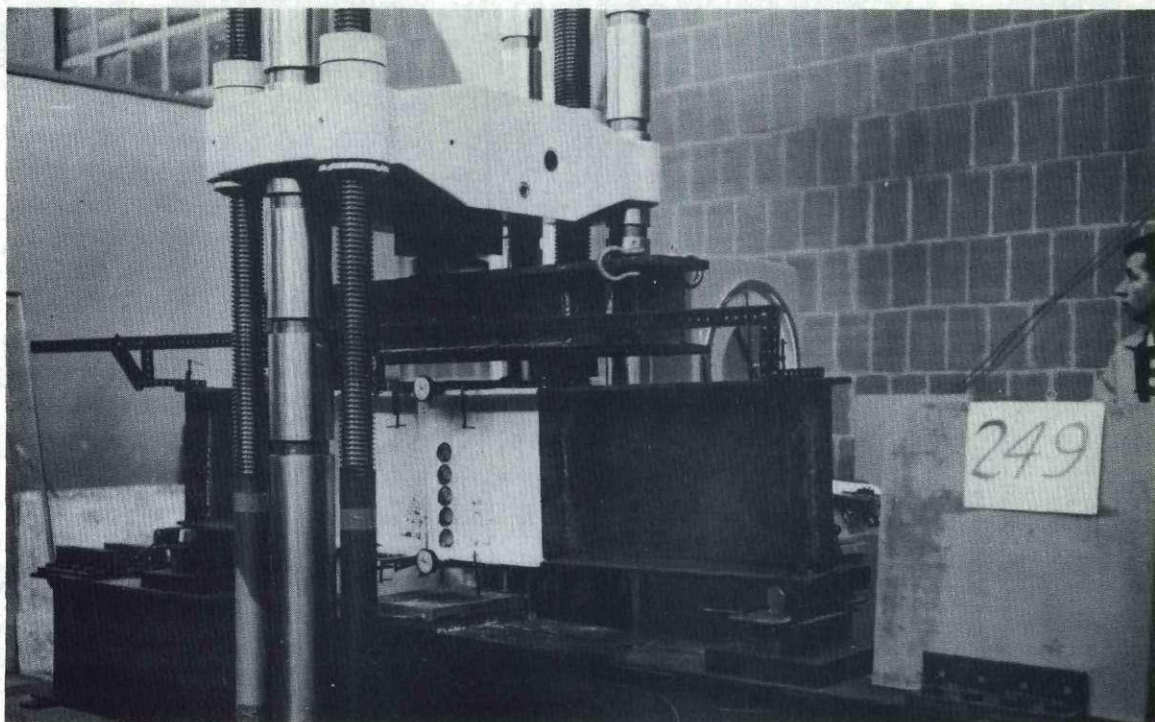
Test 18,50-8-10,7 at Load Causing Bolt Failure of Bolts 5 and 10
